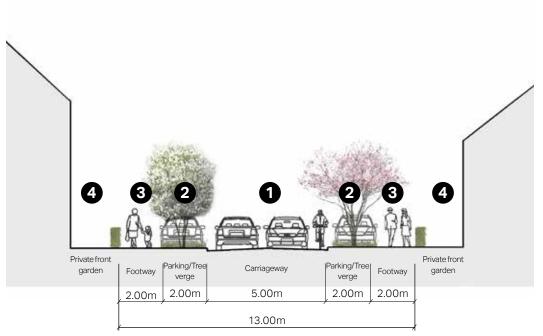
Example of a secondary road, Brentham (note: parking bays may be inset into verges).
